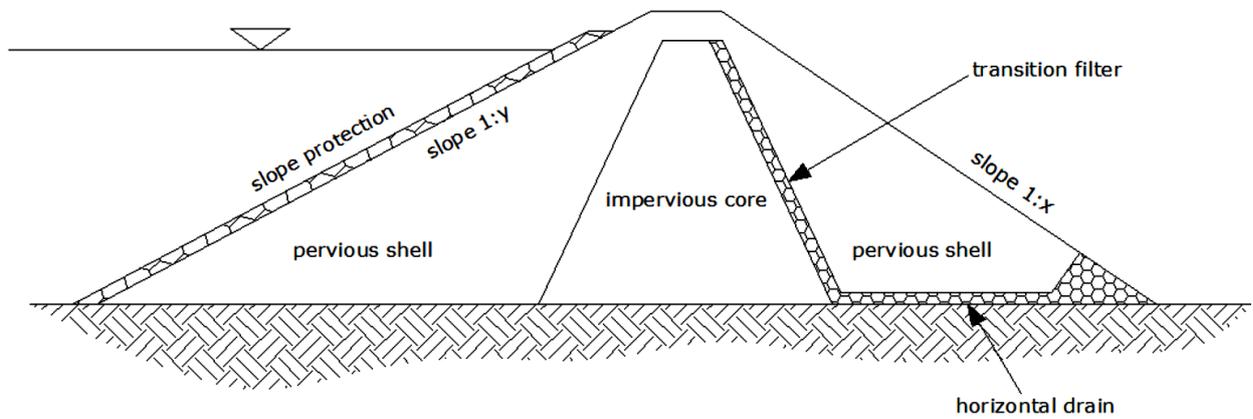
Section of central core zoned earth dam (*modified after Punmia 1992*).
